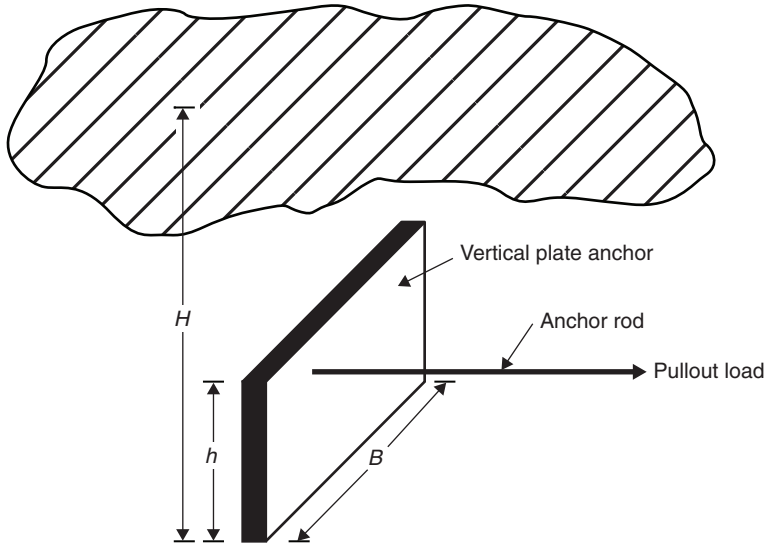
Vertical plate anchor at the base of a retaining wall to resist sliding
